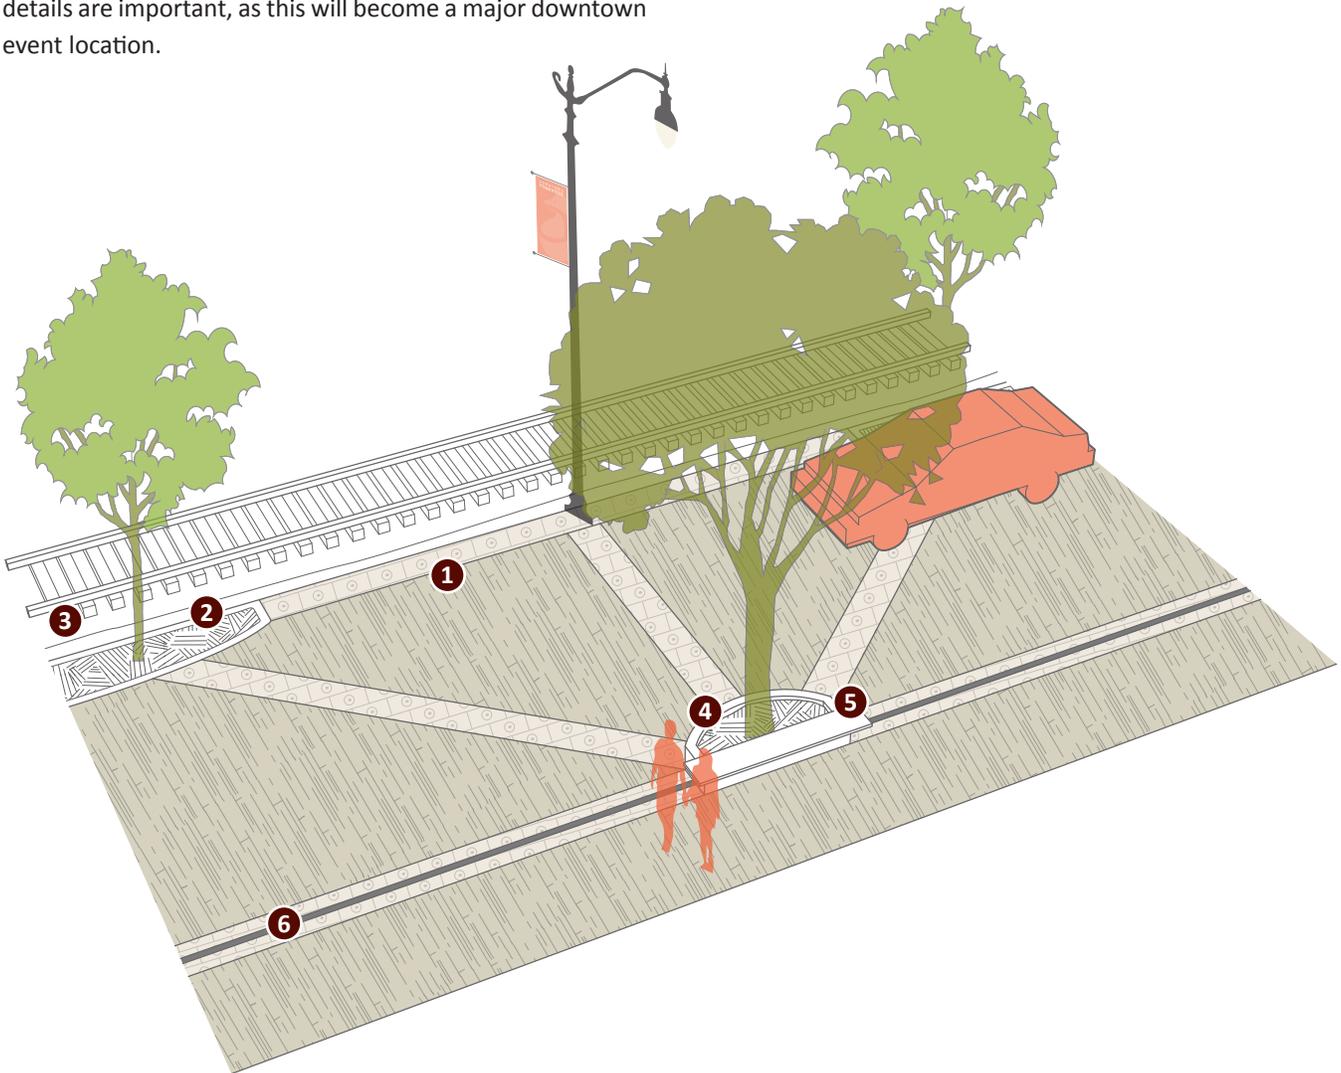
Hydraulic Street Diagram (Farr Associates)
